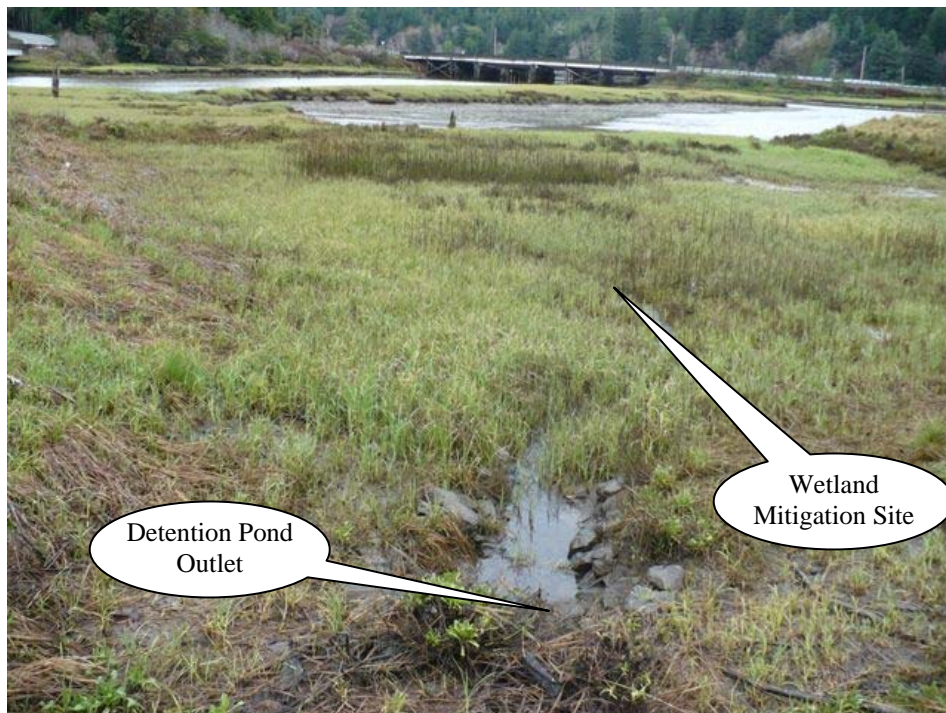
Photo showing the detention pond outlet. This pipe discharges directly into the wetland mitigation site shown.
